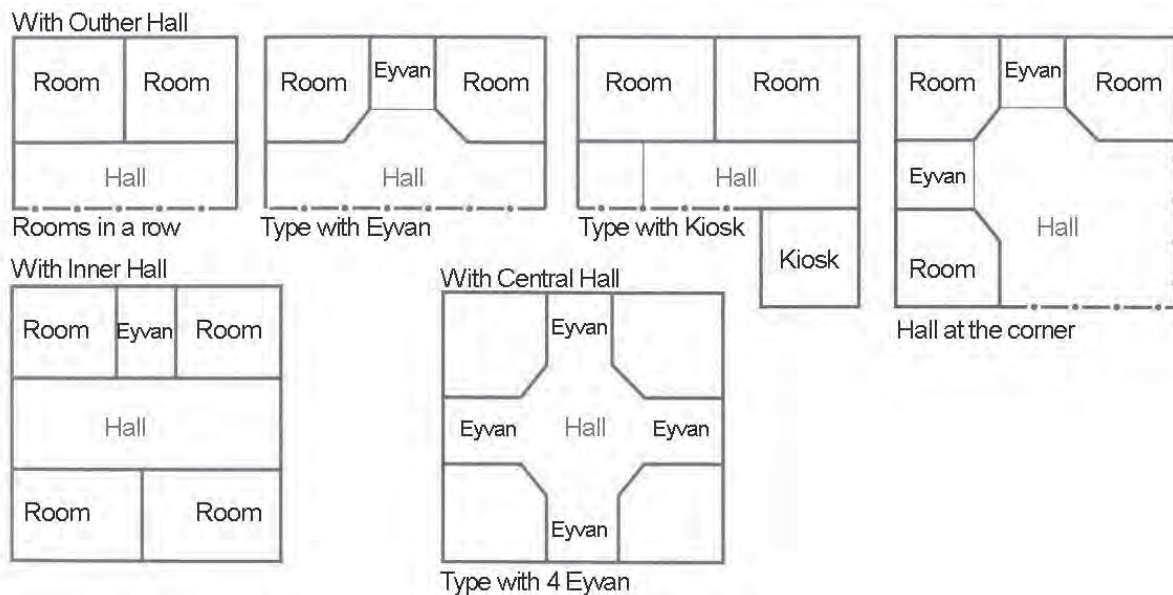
Plan types and plan components of Traditional Turkish Houses [8]
